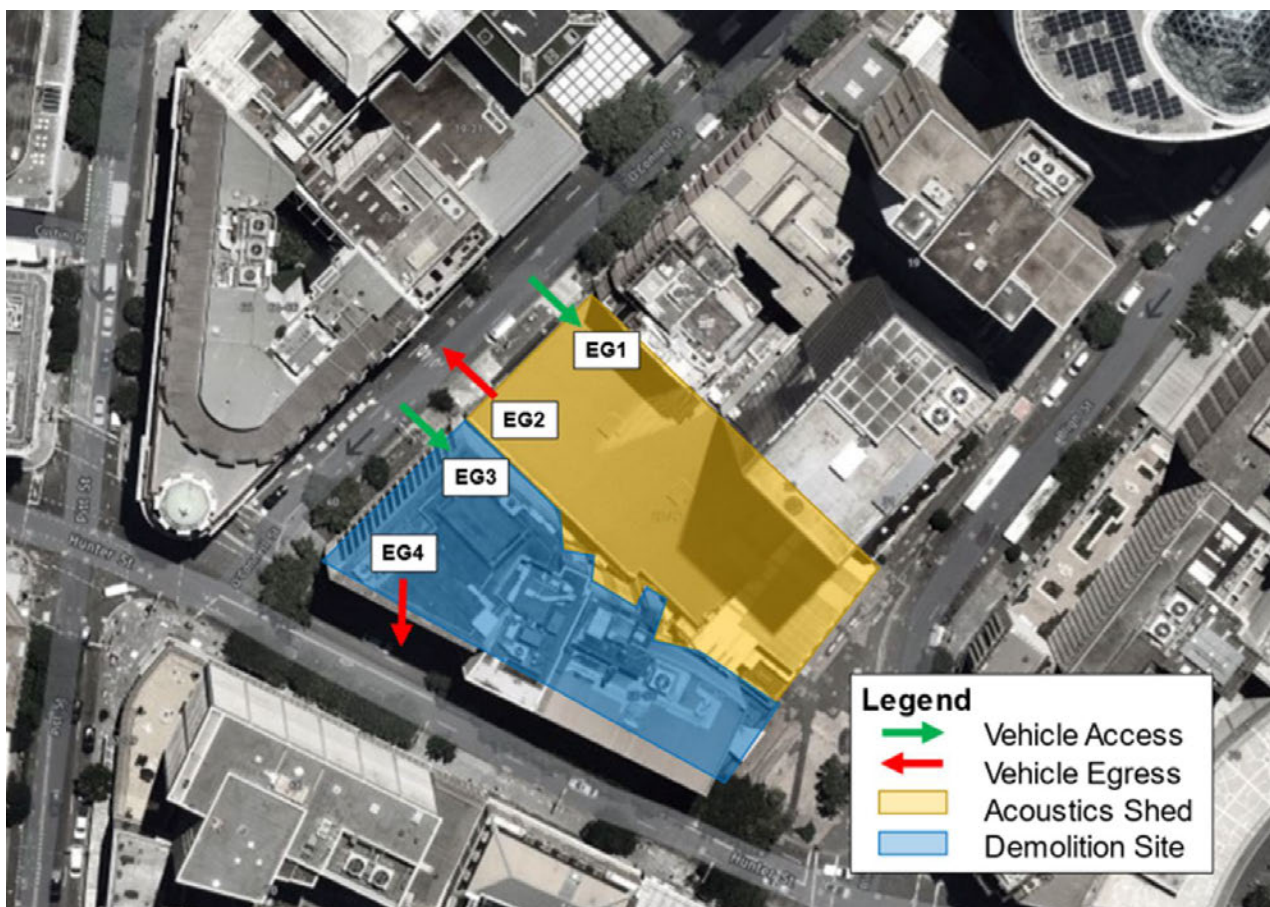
Proposed Hunter Street East Construction Site Access Locations During Demolition
